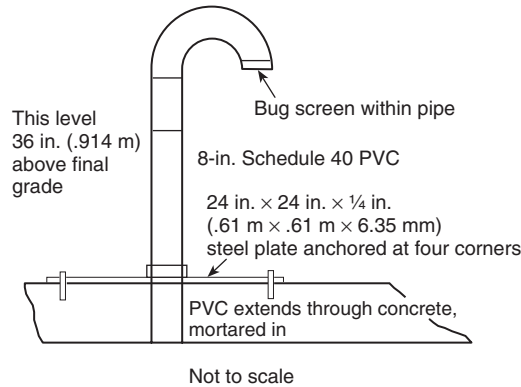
(d) Detail B — fill pipe. (Courtesy of New Boston Fire Department, New Boston, NH)
